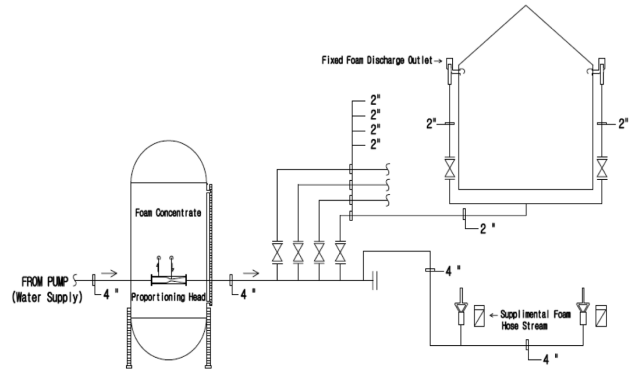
Installation drawing of an outdoor benzene storage tank foam fire-extinguishing system already installed.
